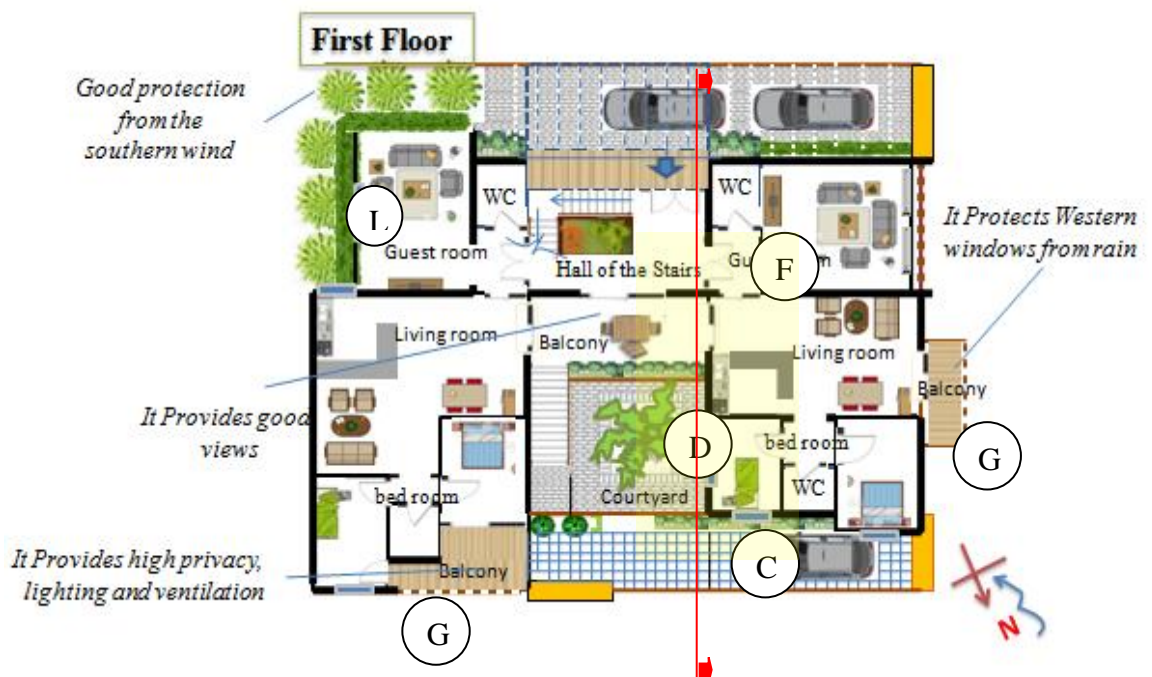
; this floor illustrated the solution of, Courtyard, hall of the stairs, balcony
